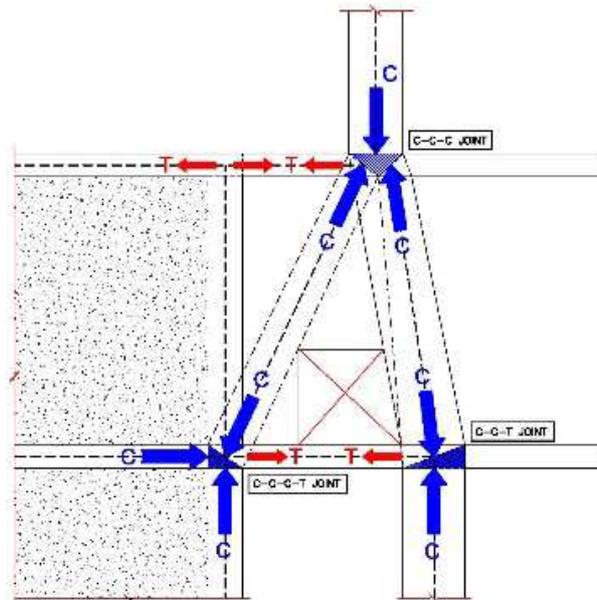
Strut-and-tie truss model for the level 19-20 outrigger.(Source Bouygues-Thai)
